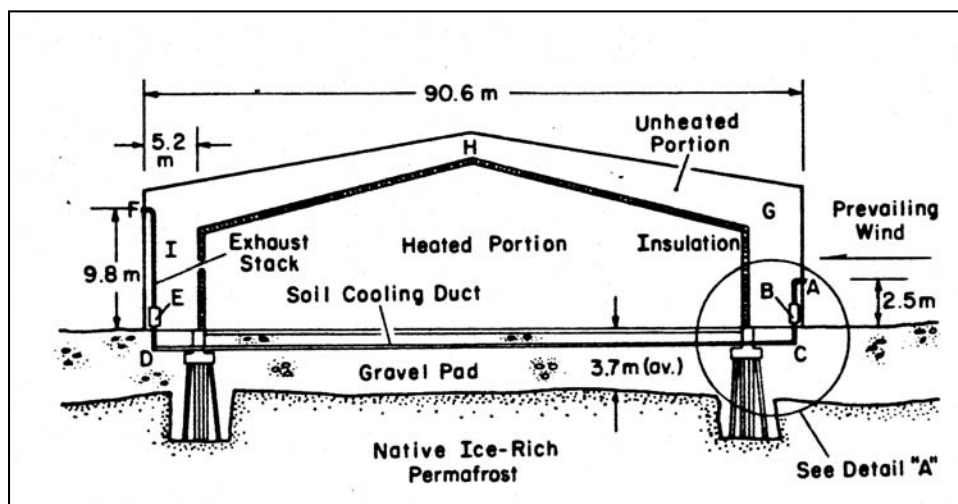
Elevation view of hangars at Thule Air Force Base. The Navy and Air Force hangar at NARL are similarly constructed with pile and pile cap systems.
